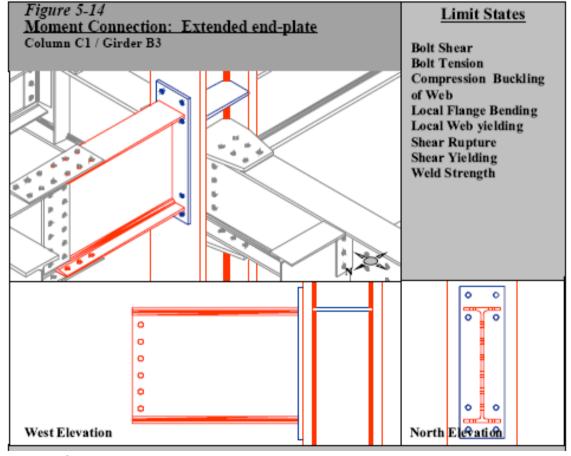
Moment Connection: Extended end-plate. Column C1 / Girder B3.
